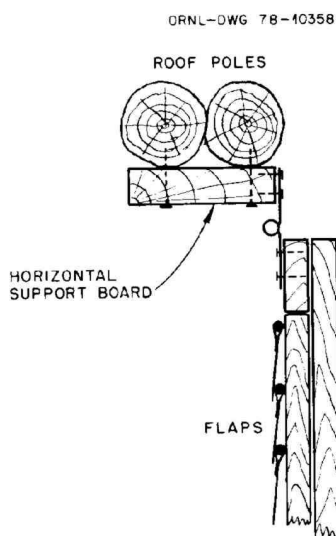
ROOF POLES. HORIZONTAL SUPPORT BOARD. ORNL-DWG 78-10358
